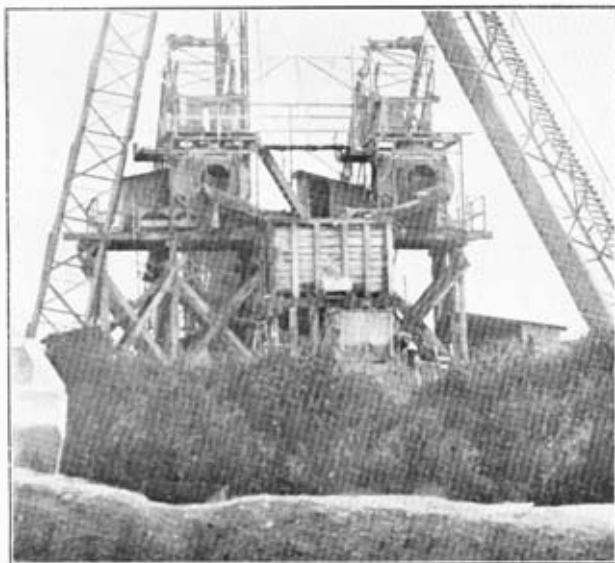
Concrete Mixing Plant under Cable-crane Tripod.
